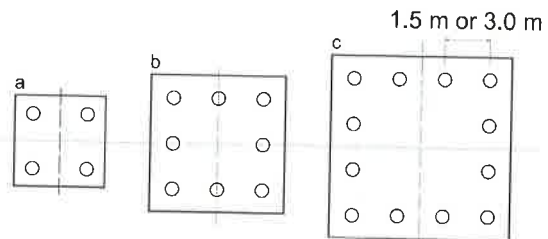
Proposed pile layouts, (a) 4-pile group; (b) 8-pile group; (c) 12-pile group
